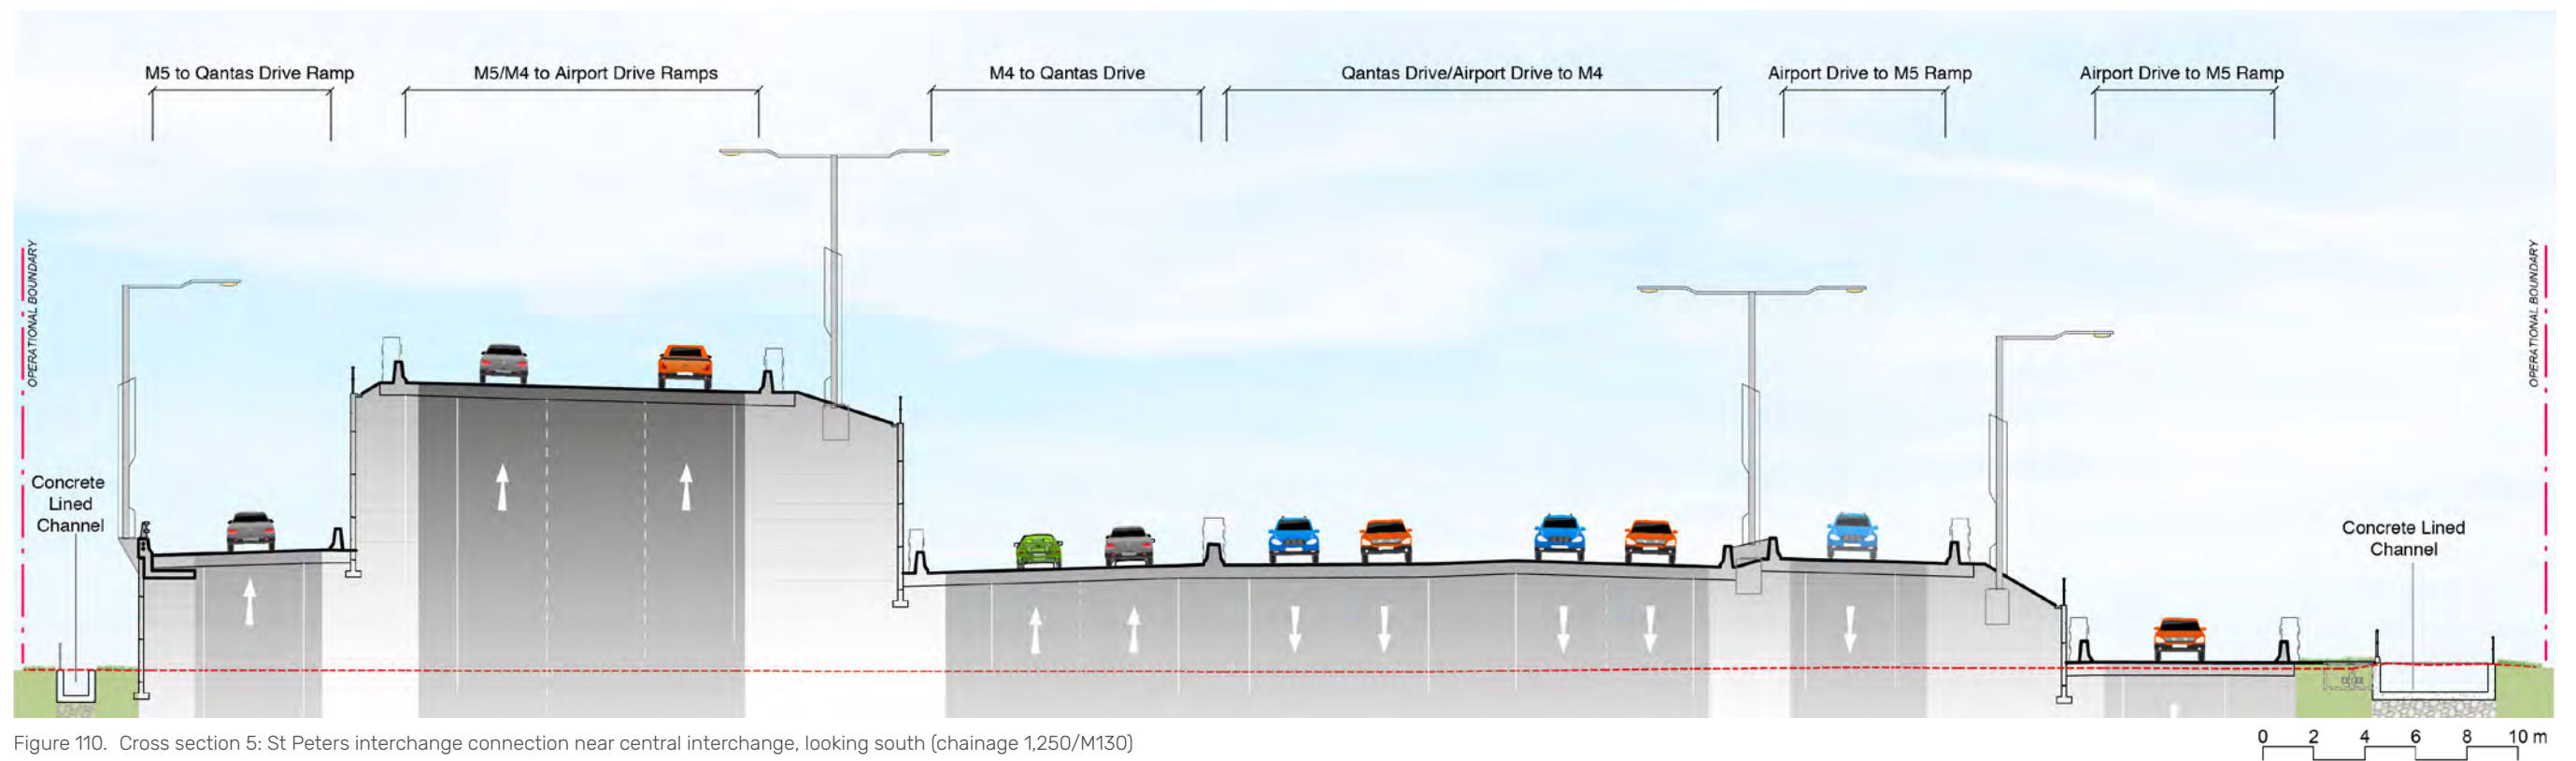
Cross section 5: St Peters interchange connection near central interchange, looking south (chainage 1,250/M130)
